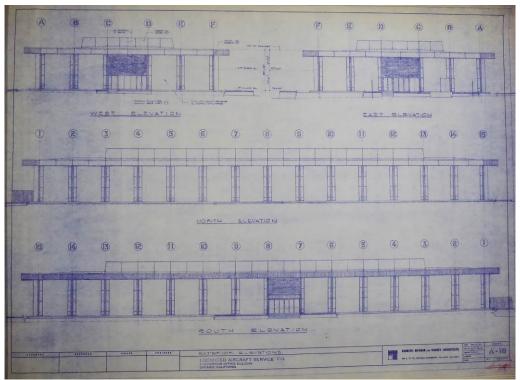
Elevations. Architect's drawing, 1967. Source: LAWA records.
